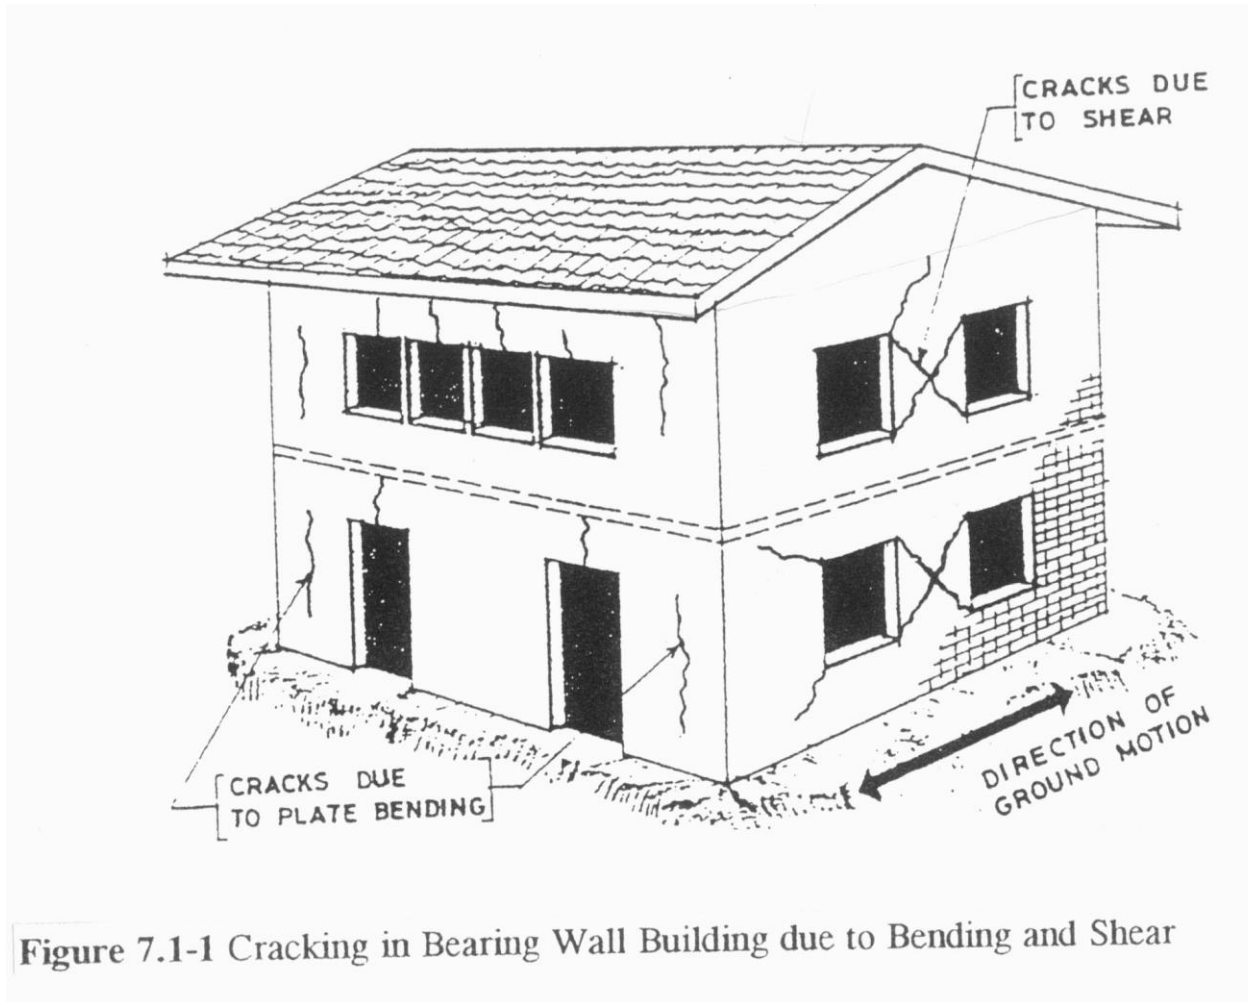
Cracking in Bearing Wall Building due to Bending and Shear
